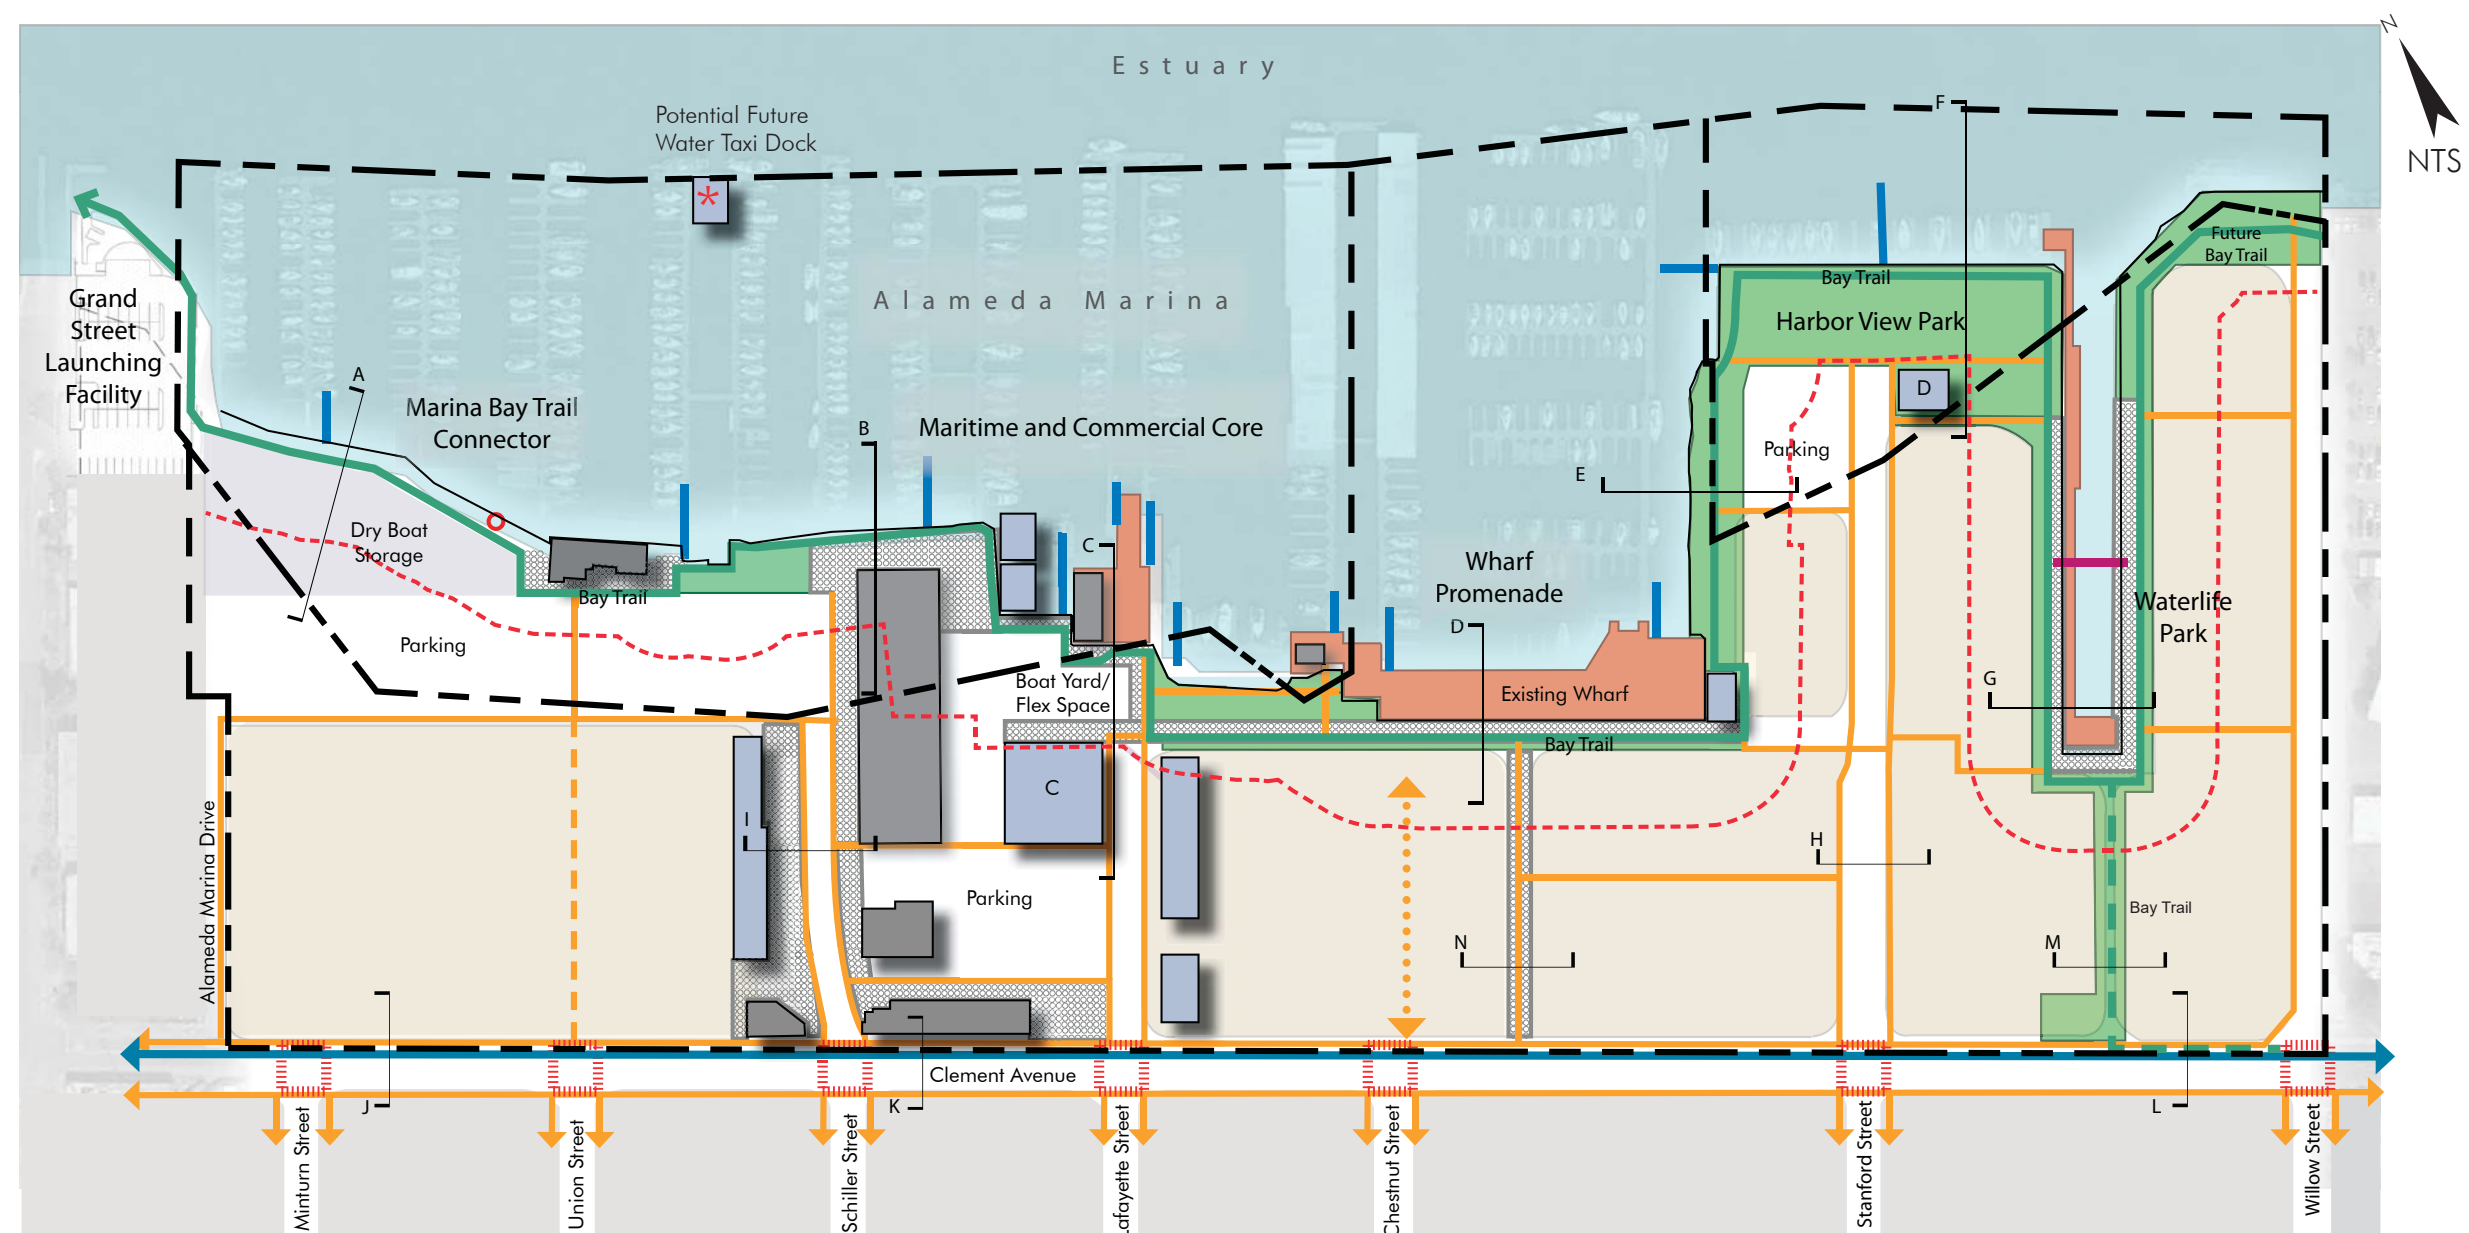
Conceptual Pedestrian Circulation and Open Space Plan
